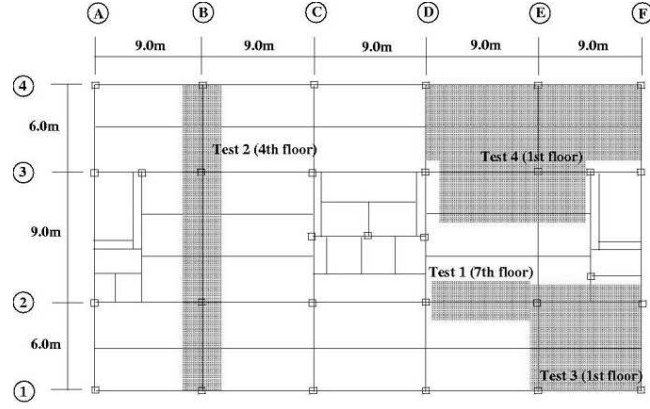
Plan of Cardington test building showing location of the British Steel fire tests [8]
